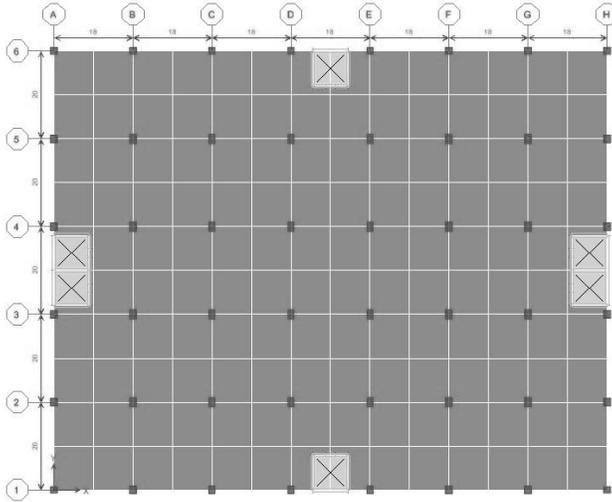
Layout Plan of Flat Plate building with lift cores at four different positions
